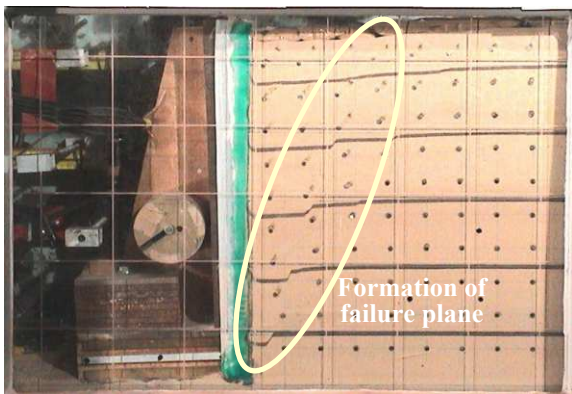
Formation of failure plane in the backfill for the model constructed on 5 cm-thick level ground (after a shaking step at 350 gals).
